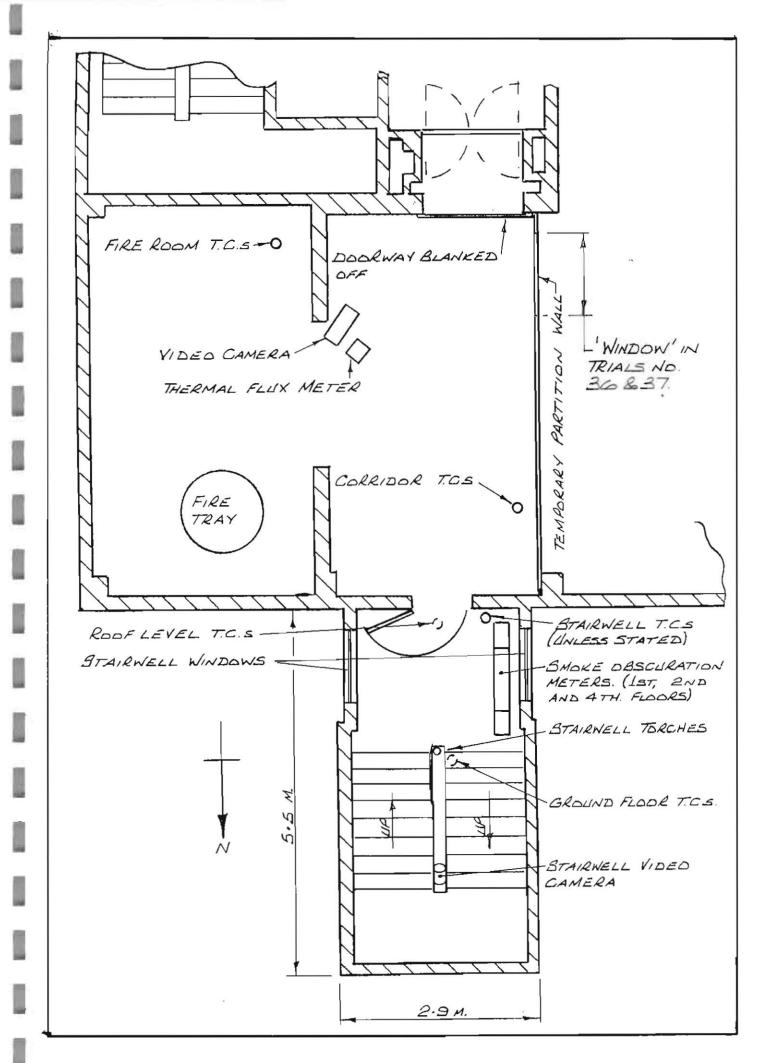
Plan of First Floor Showing Positions of Fire Instruments etc
